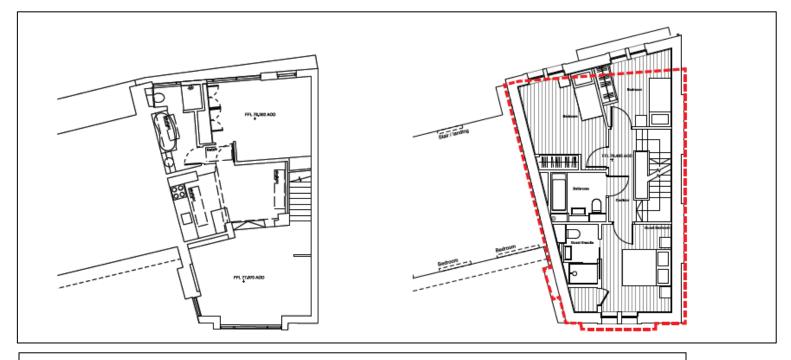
The existing floorplan on the left, and the proposed on the right. As can be observed the building line of the proposed scheme is consistent with the existing situation where 4a adjoins 4b.
